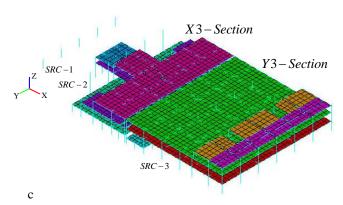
Three part of the terminal building 2 (continue) (c) RC frame
